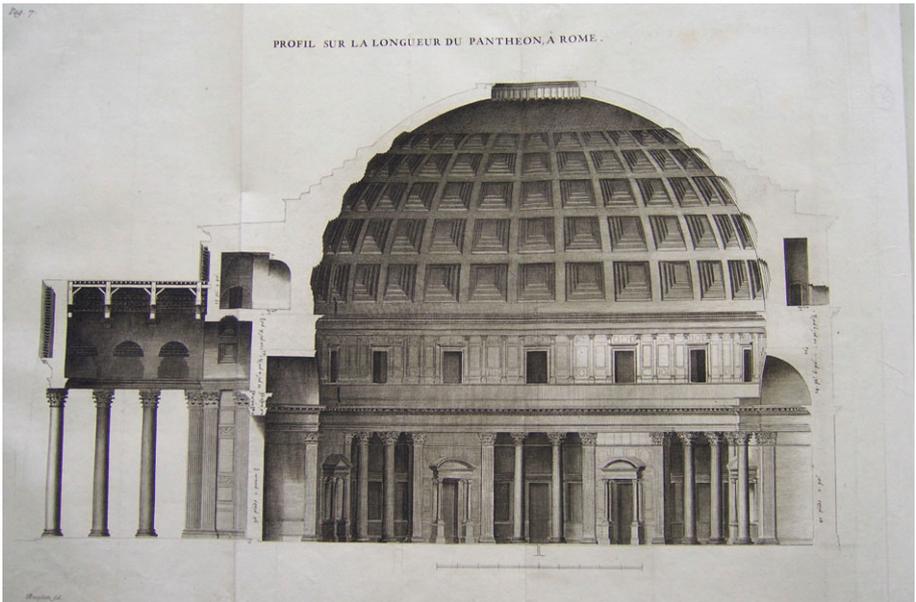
Pantheon cross-section drawing by Desgodetz [1779], without dimensions
